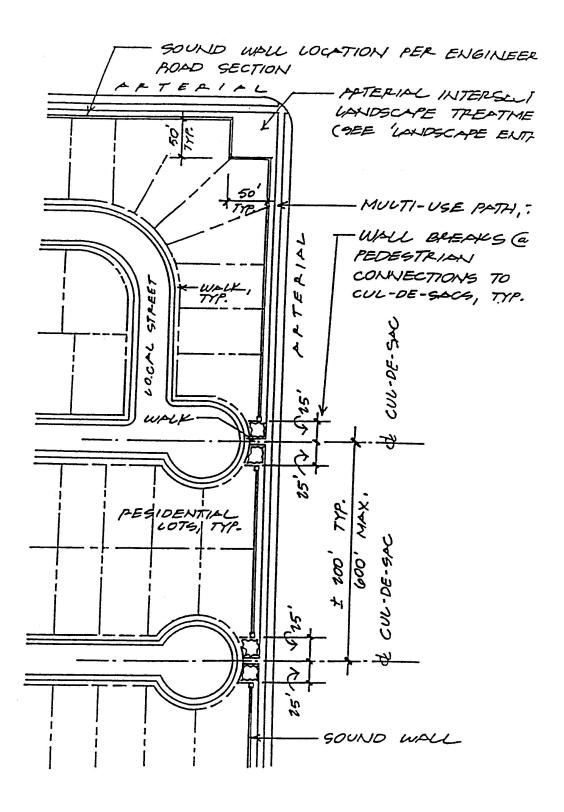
COMMUNITY SOUND WALL, TYPICAL PLAN
